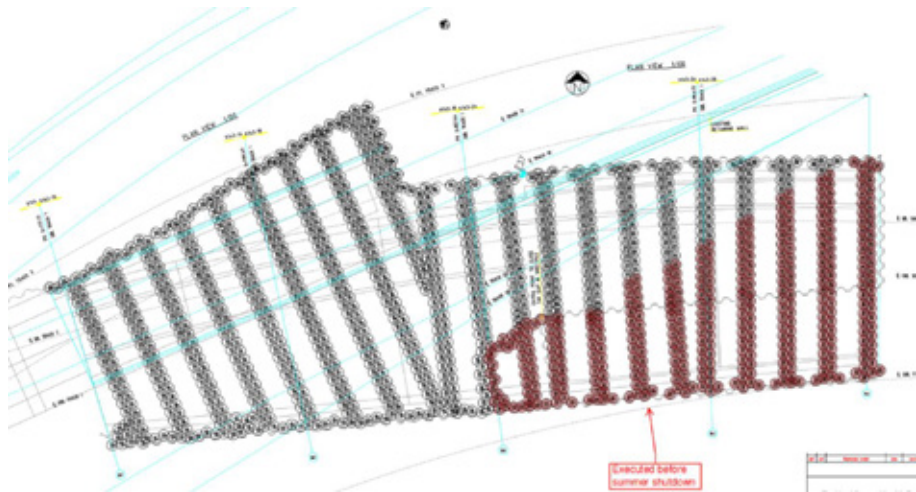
Design for Strutting Slab with jet grouting in between sheet piles, red marked columns where executed prior to the summer shutdown
